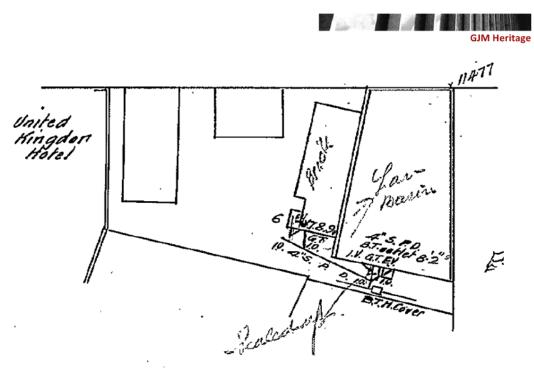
The site of the proposed building for owner John Markby – plans dated 1918 (PSP No. 53990).
